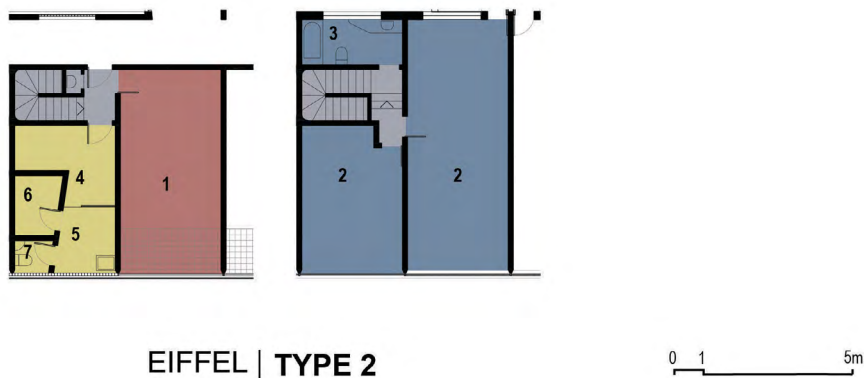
Eiffel Building – type 2 apartment (1951-53)
